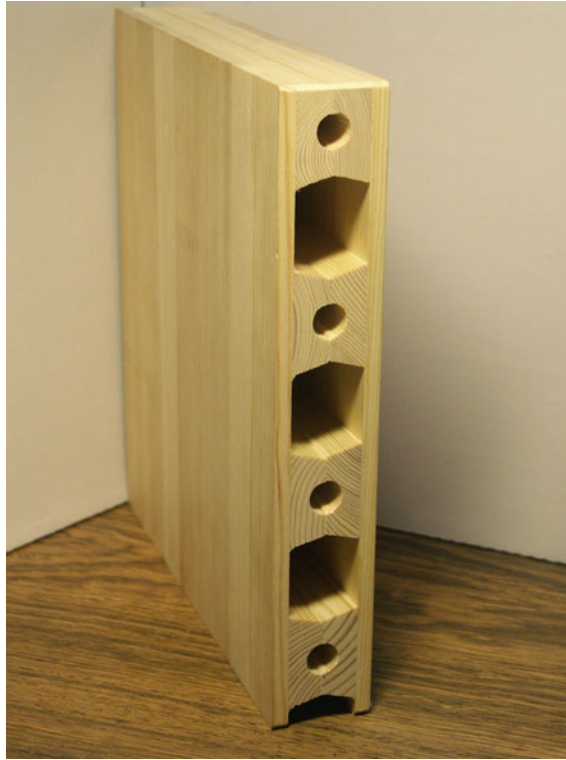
Example of a lightweight panel manufactured of solid wood. The core elements are cross-laminated to the surface panels. The holes in the core elements are for efficient assembly
